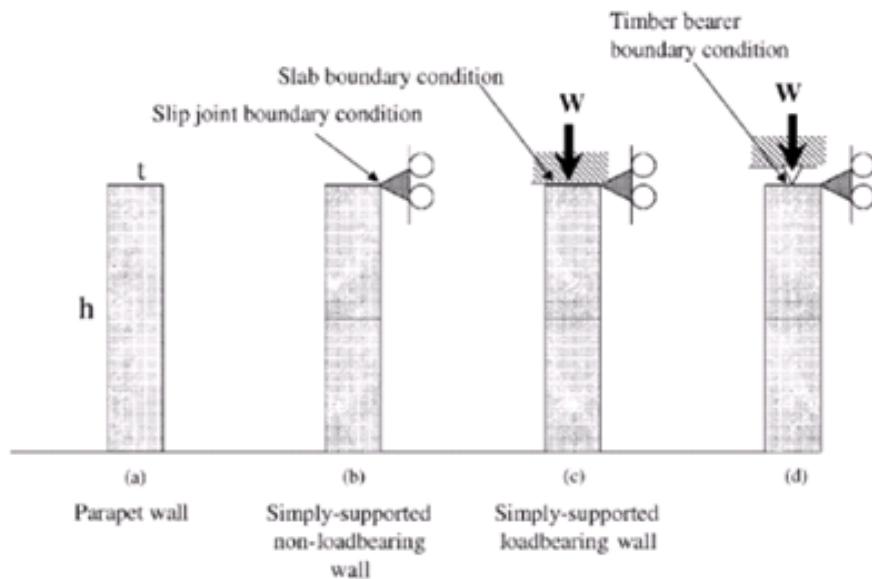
Unreinforced masonry wall support configurations (Doherty et al. [2002])
